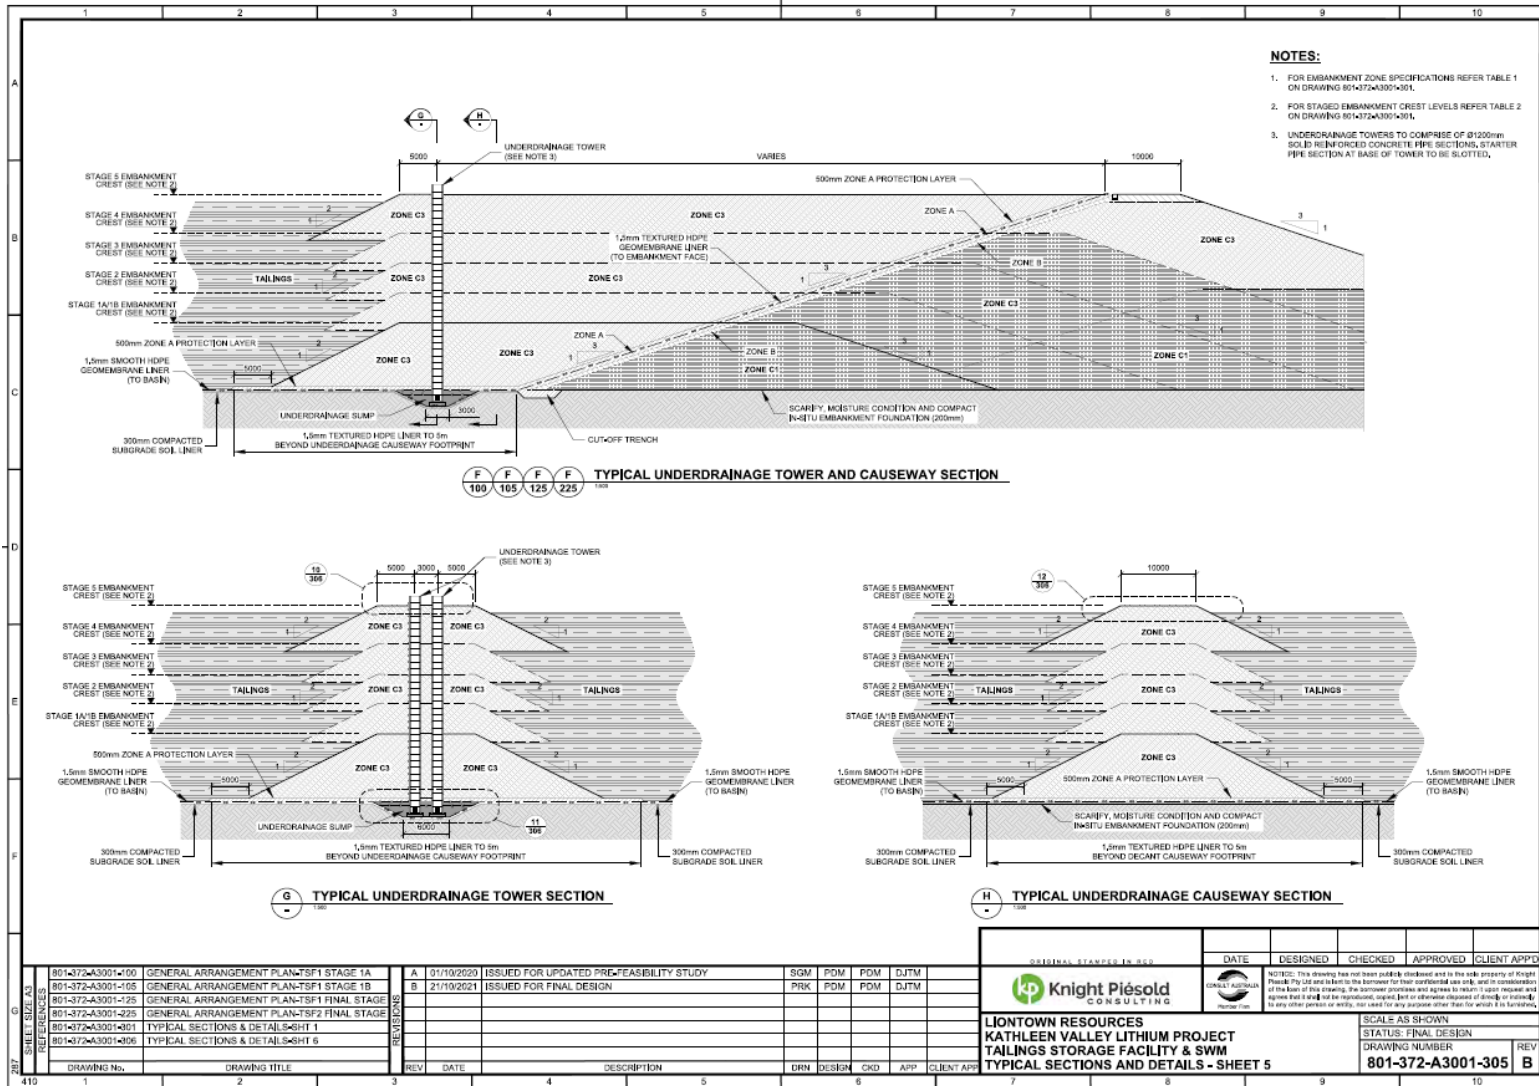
Tailings Storage Facility Section Detail, Underdrainage – 801-372-A3001-305
